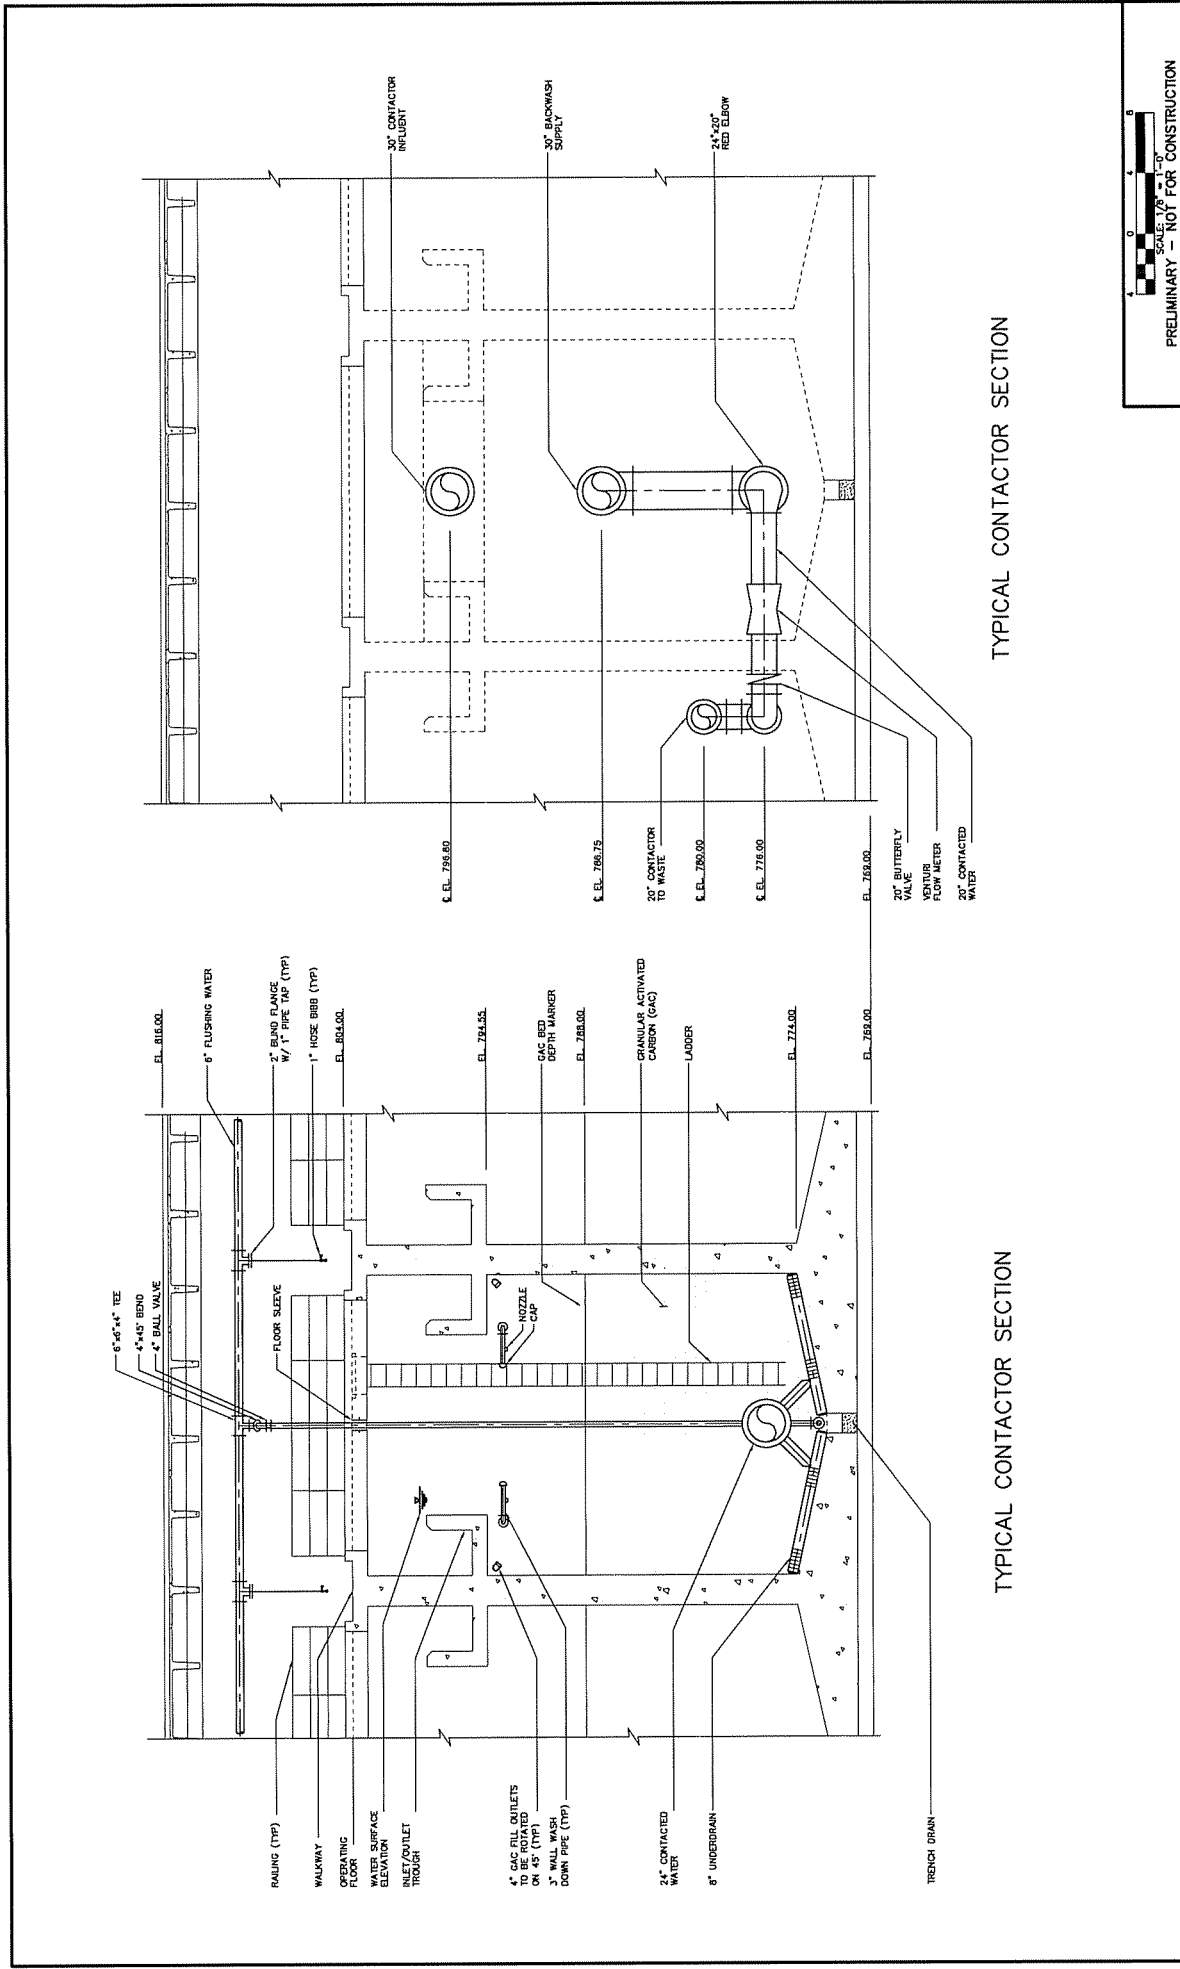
shows locations of walkways, entrances, stairs, and control rooms located on the GAC Building operating floor level. A typical section through a GAC contactor is shown in Figure 4-14. The sections illustrate the following details:
